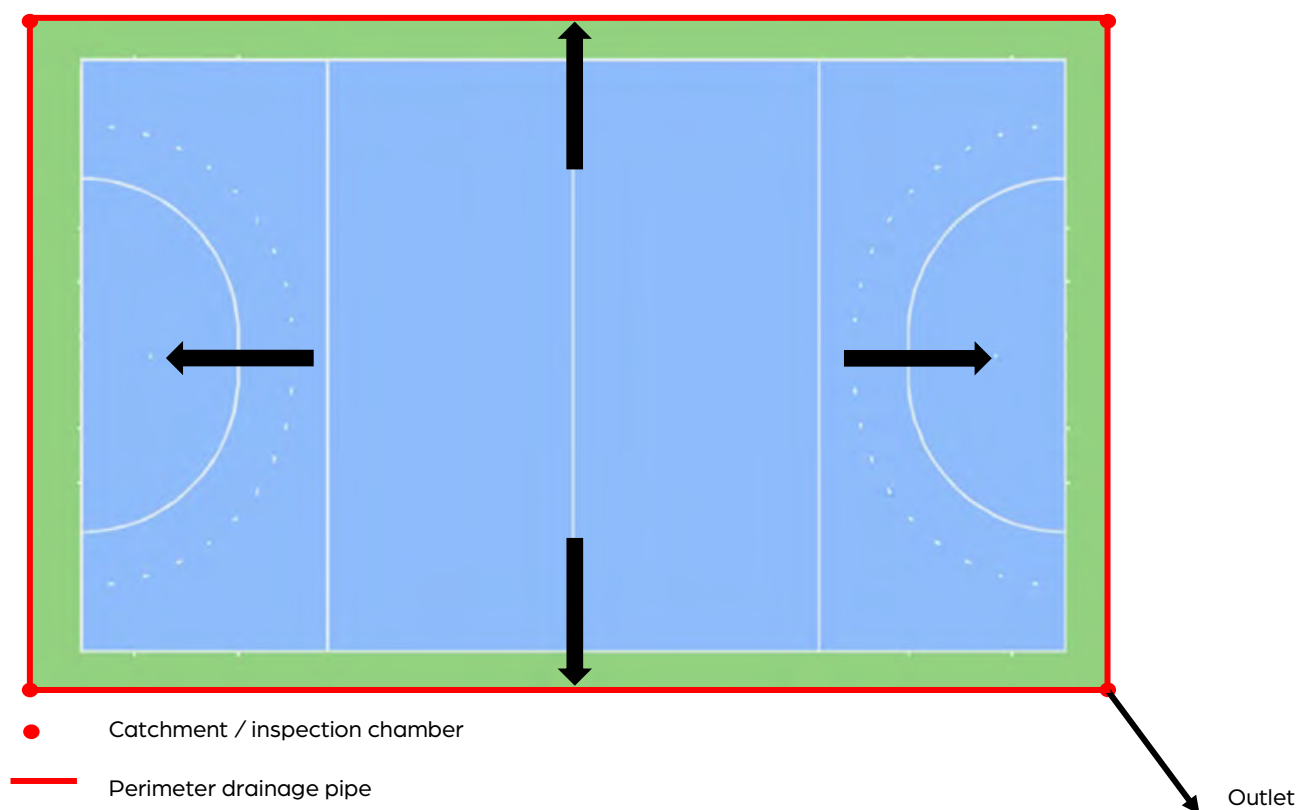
typical sub-field drainage system used with horizontally draining field construction.
